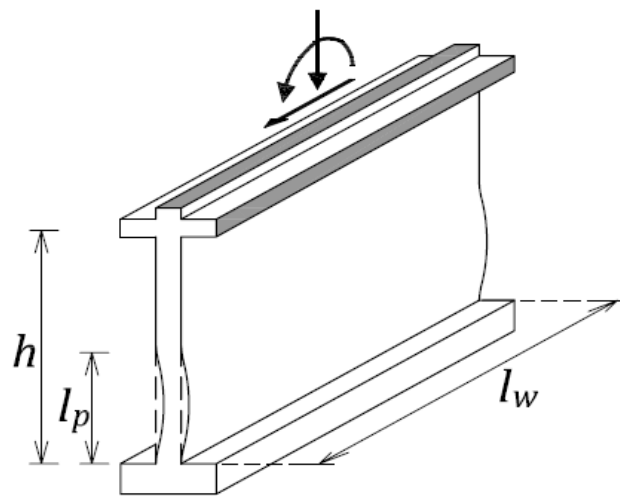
Out-of-plane instability in a shear wall subjected to in-plane loads [3]
